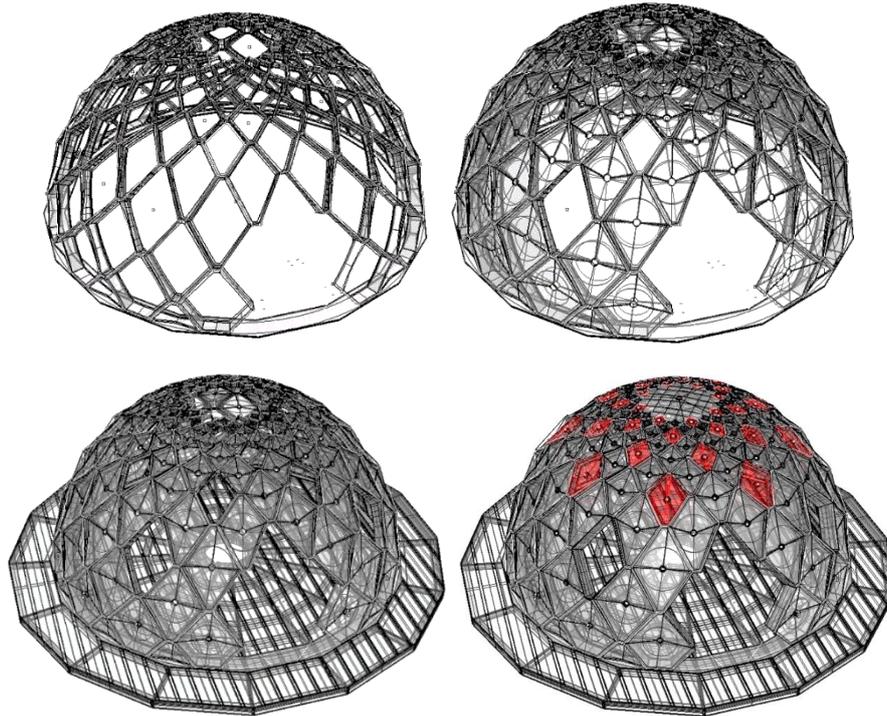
9 Form finding of some construction details and the design of the support and foundation (A, Flanges as supporting frame for gluing; B, Tension ring at the bottom part; C, wood foundation; D, Top element and transparent cells)
